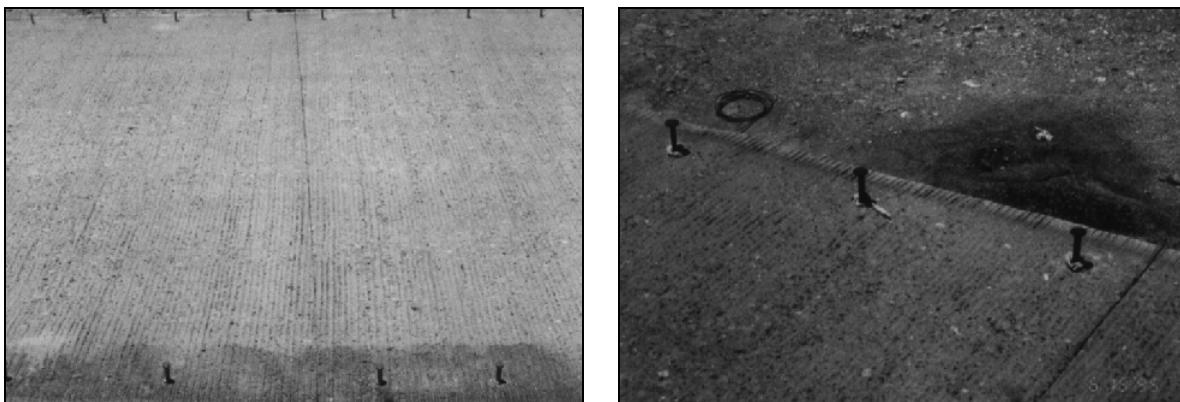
Full-scale experimental bonded concrete overlay: (a) Layout of test sections; (b) A typical test section
